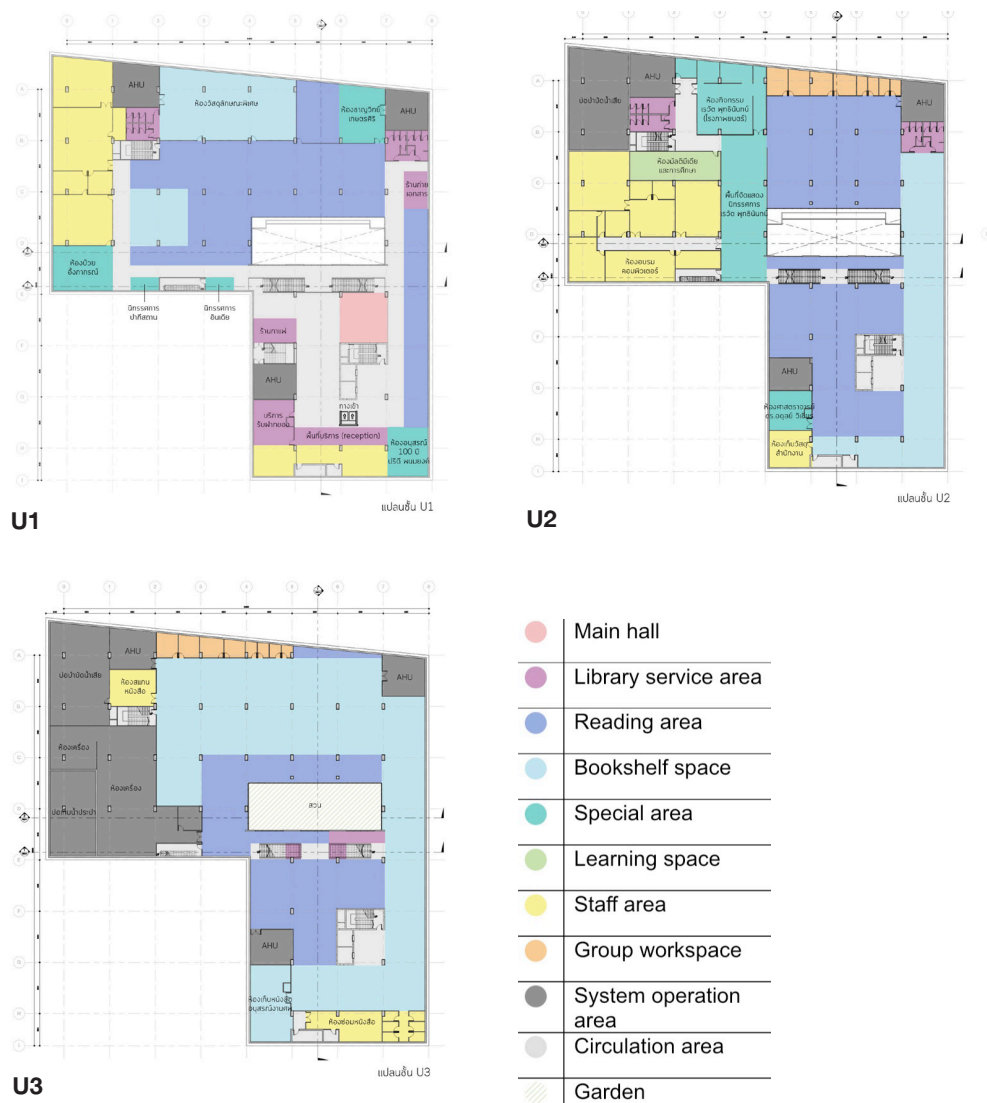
Floor plans showing current usage areas (top left) U1 floor plan (top right) U2 floor plan (bottom) U3 floor plan.
